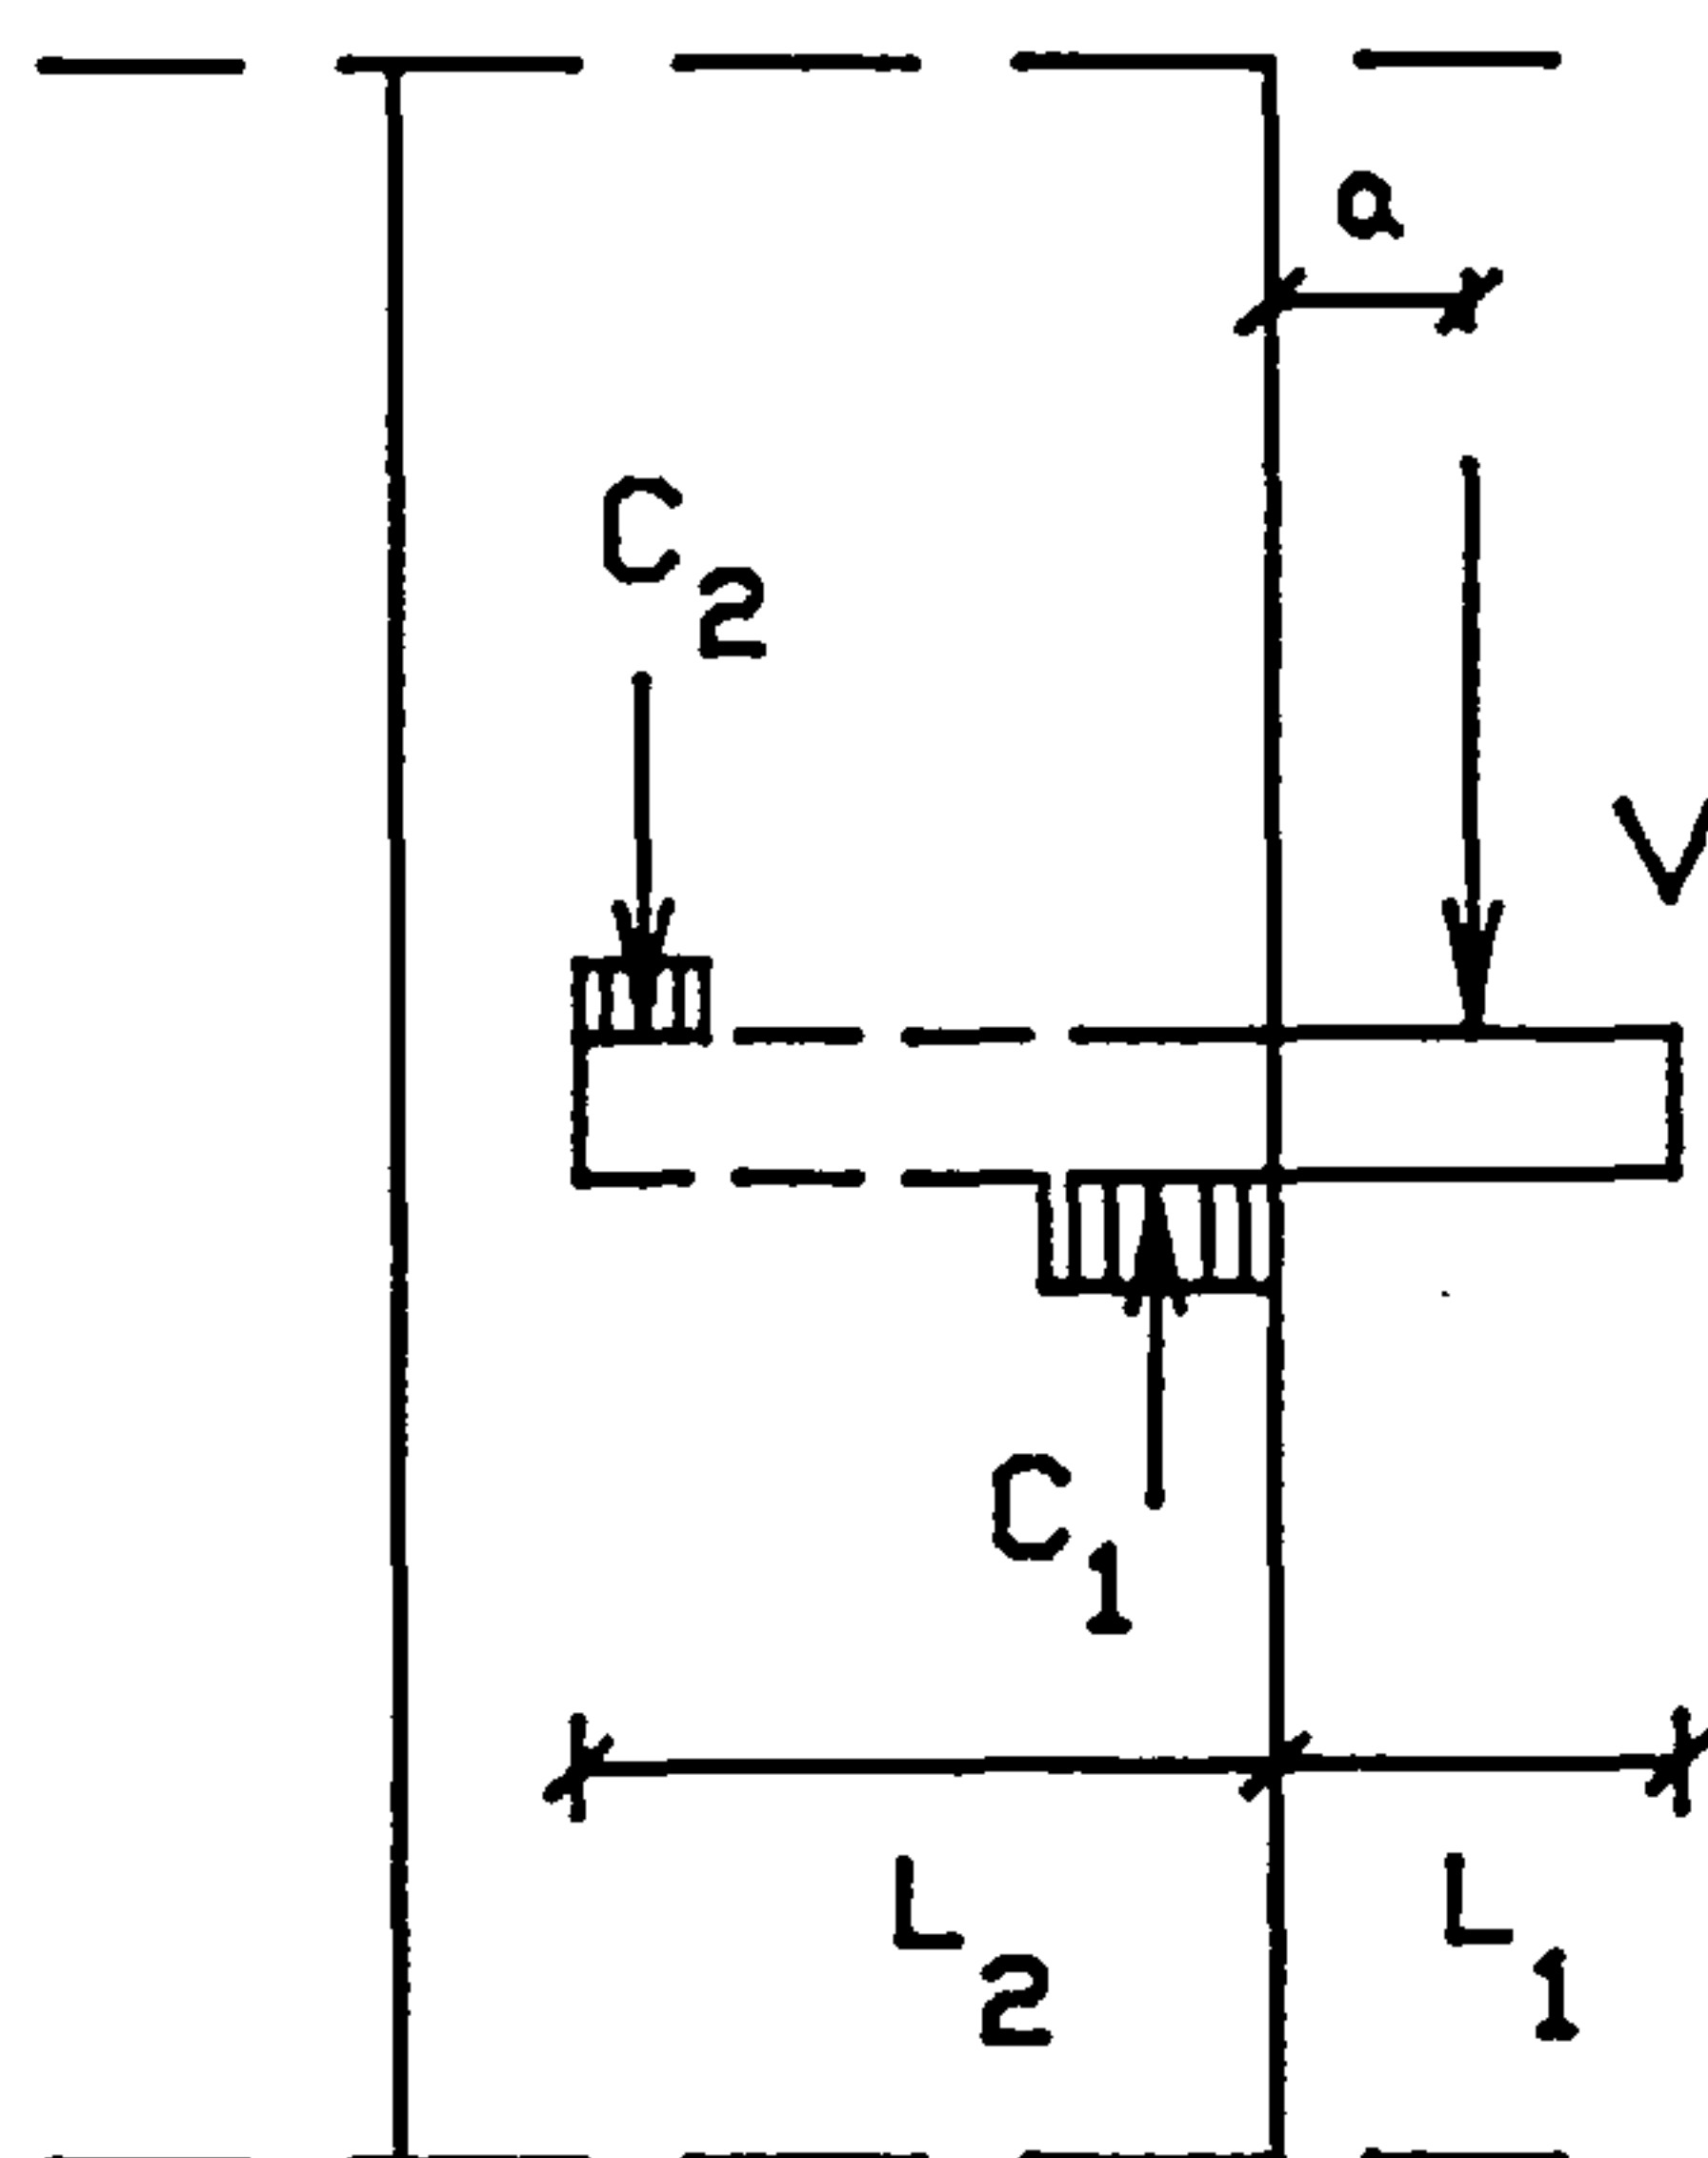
A BEAM-TO-COLUMN CONNECTION USING A STEEL BILLET.
